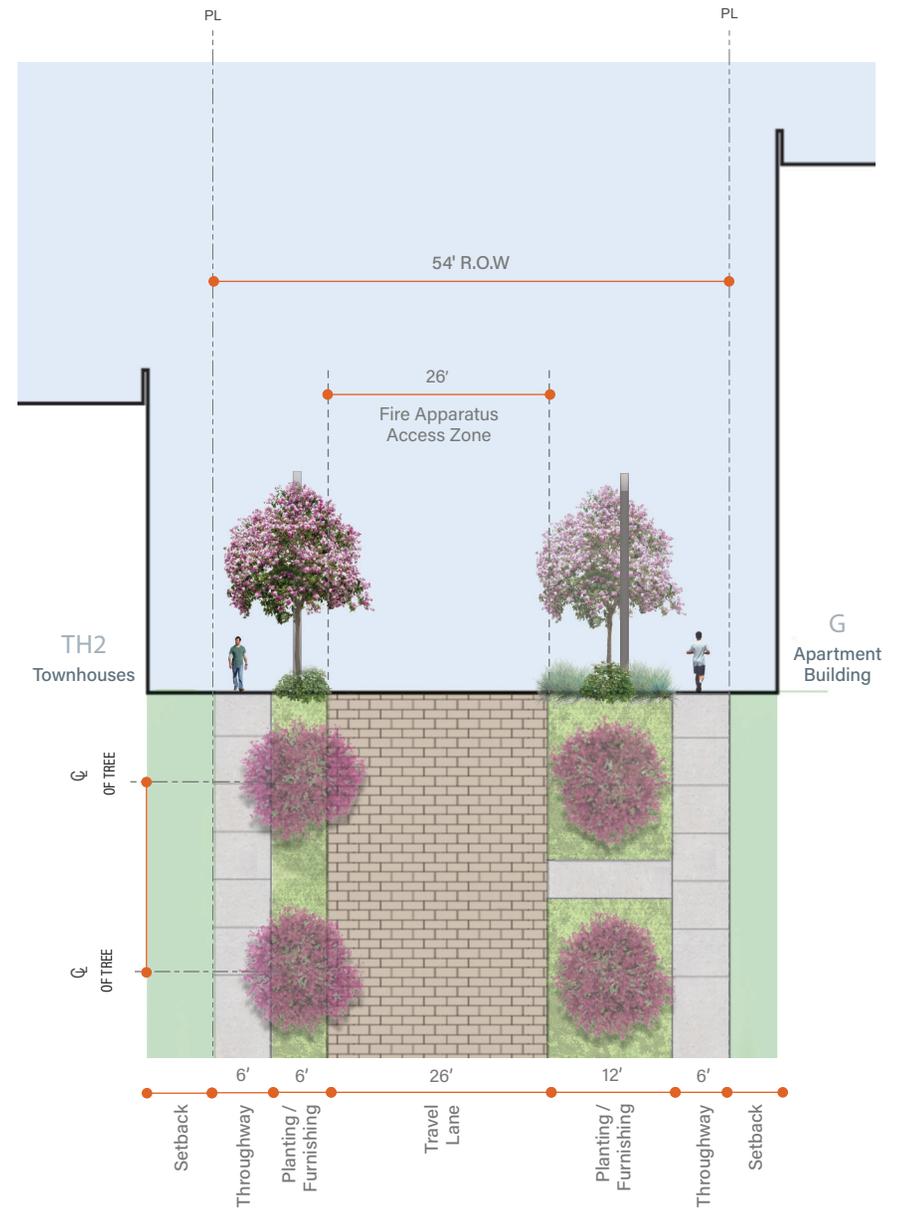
West Street North, Section 1 *see "Figure 5.15.3: West Street North, Plan Enlargement", Site Plan L.1
